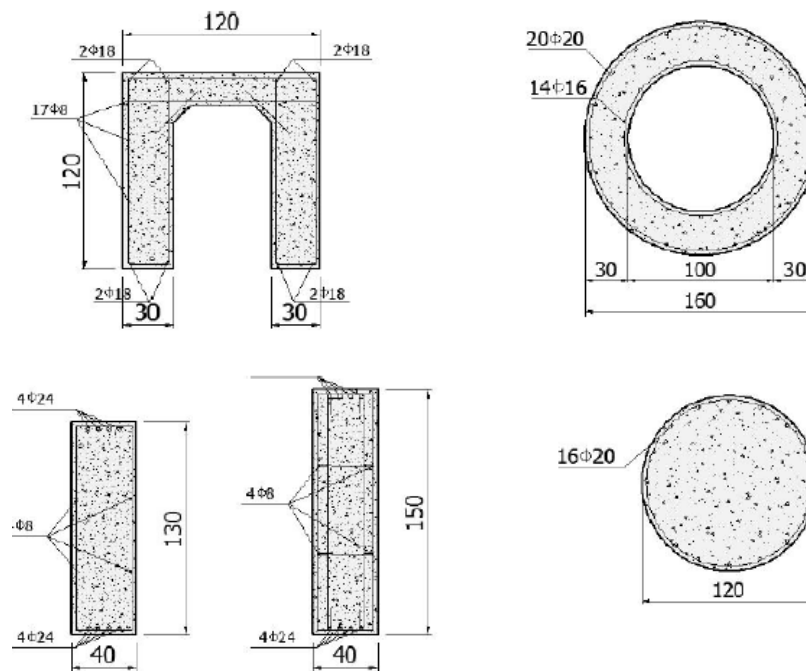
Full-scale cross-sections of the cap-beam, transverse and the columns
